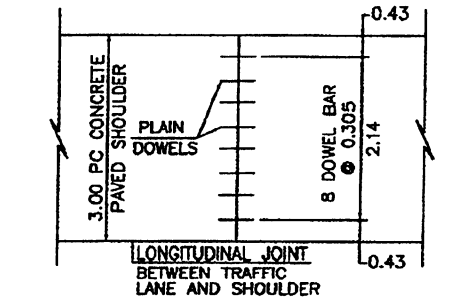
DETAIL OF LONGITUDINAL JOINT TO BE USED WHEN SLABS EQUAL TO OR LESS THAN ONE LANE WIDE ARE PLACED
